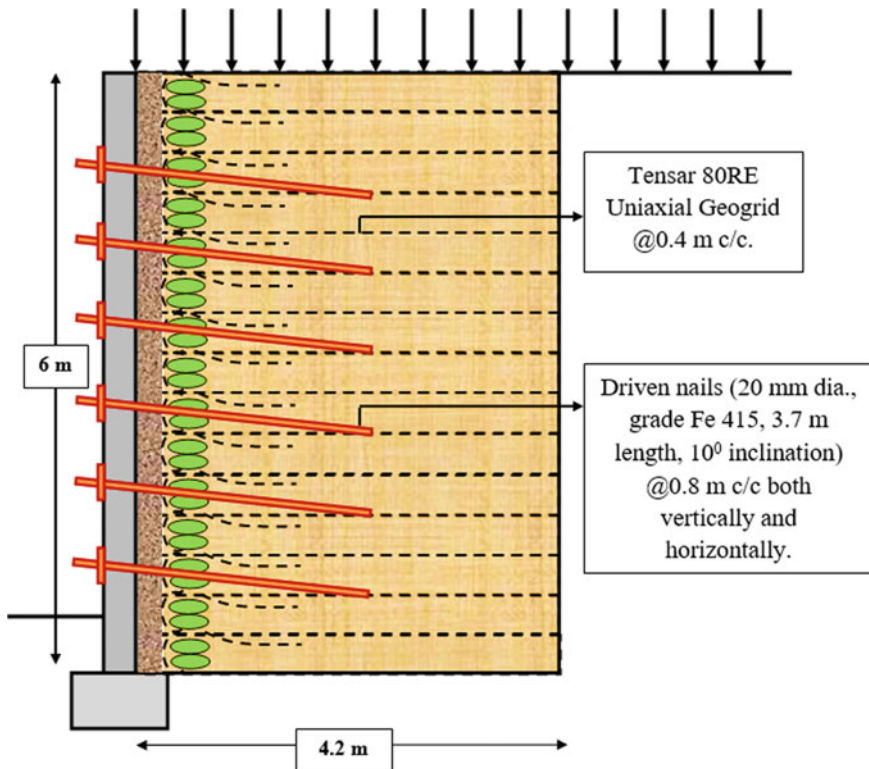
Detailed design of geosynthetic reinforced soil (GRS) wall with rigid facia using nailing
